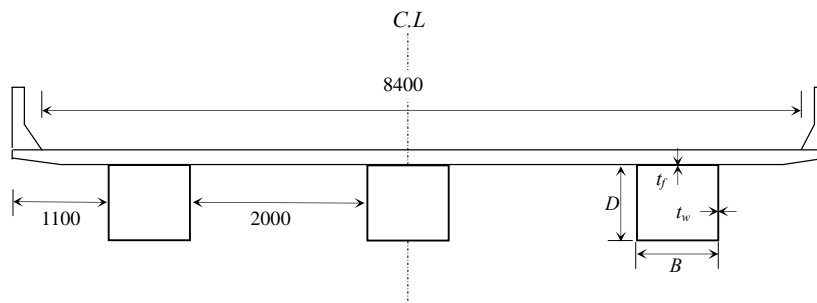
Typical Cross-section of Box-girder Bridge (Dimensions in mm)
